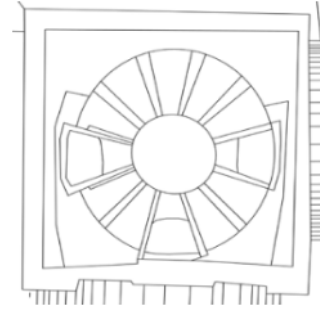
Quito, Carmen Bajo church, detail of roof plan, presbytery dome (IMP 2011).
